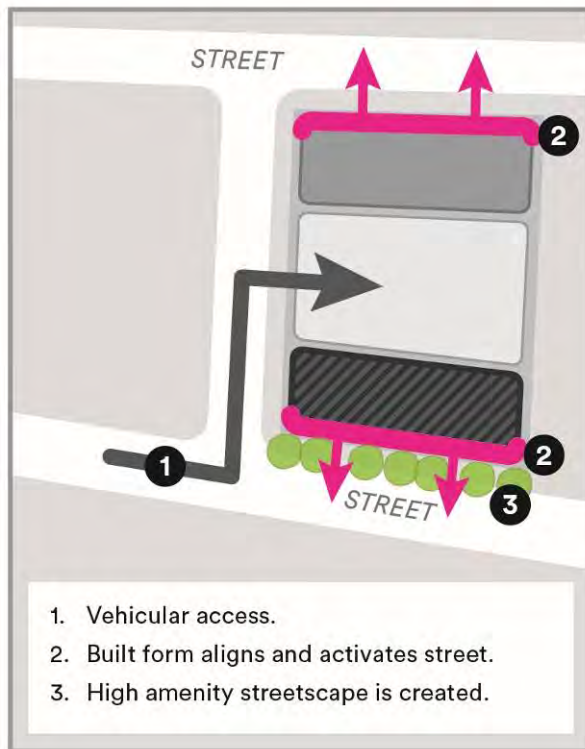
U Example of acceptable single frontage site treatment (parking)
